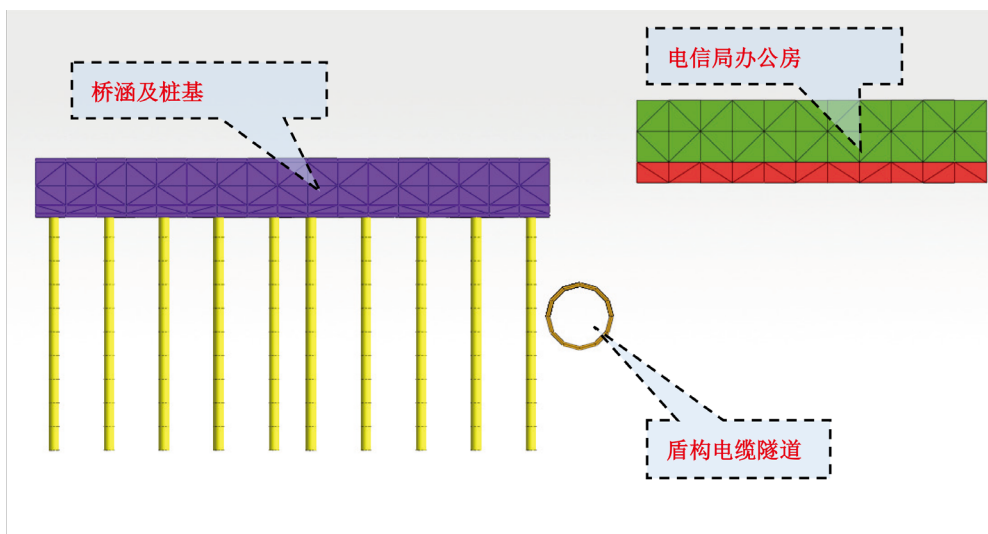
Spatial location relationship between cable tunnel, bridge and building
